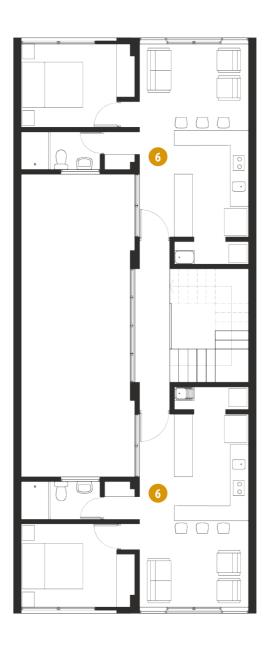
TYPOLOGY C\_FIRST FLOOR PLAN
